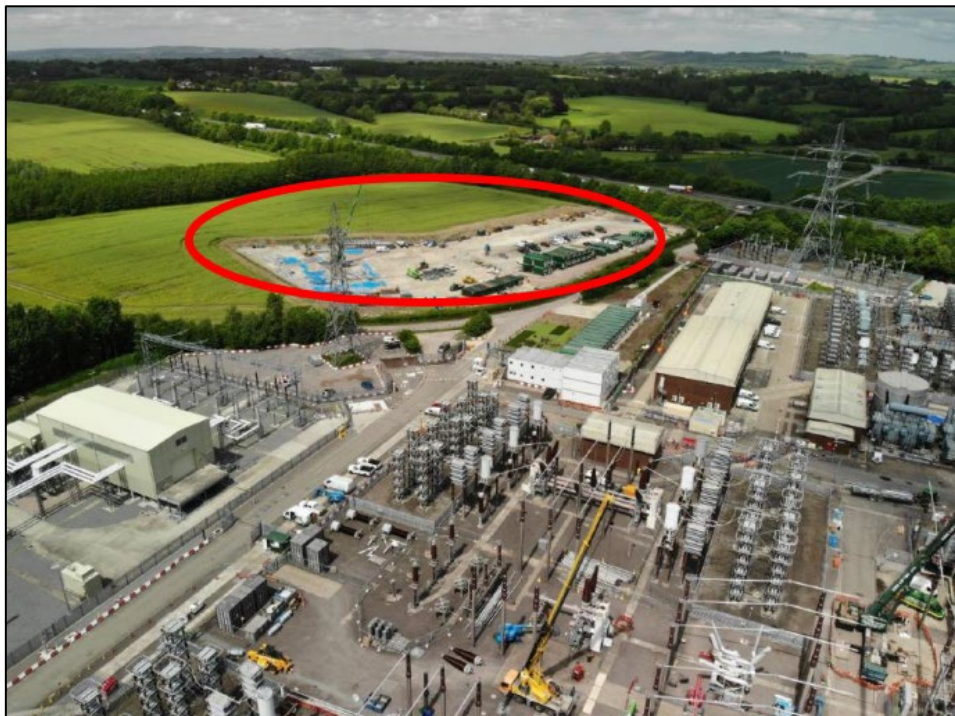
Aerial photo of Site in Red with National Grid Converter Station in Foreground
